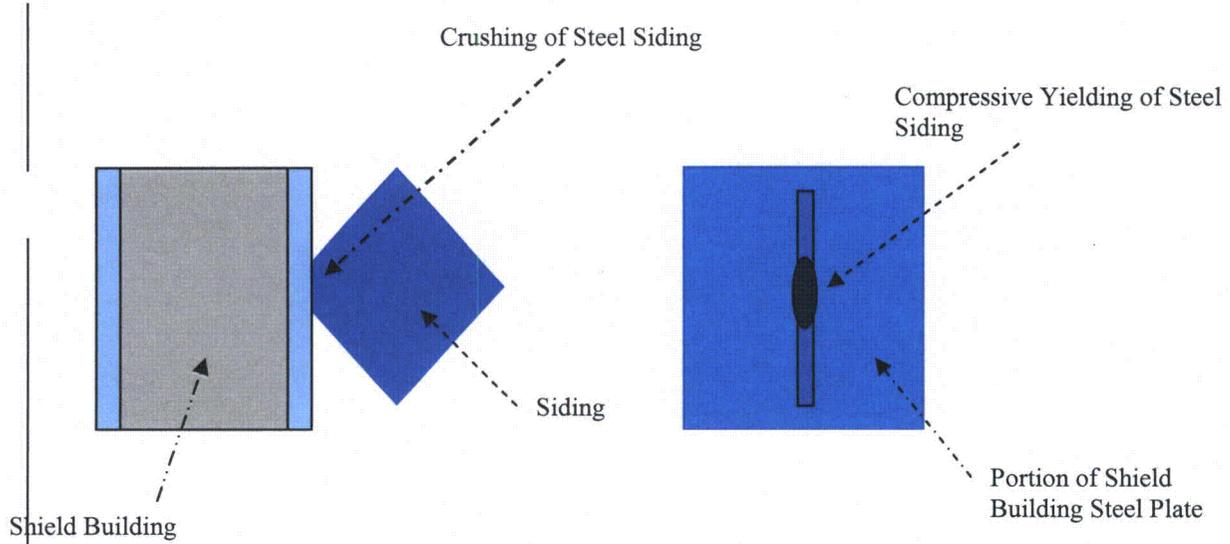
SEB1-03 – Siding Crushing on Shield Building
